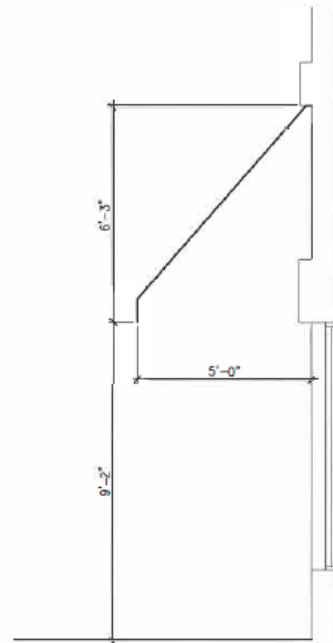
Addition of Exterior Lighting – Proposed compared to other approved DDR lighting
